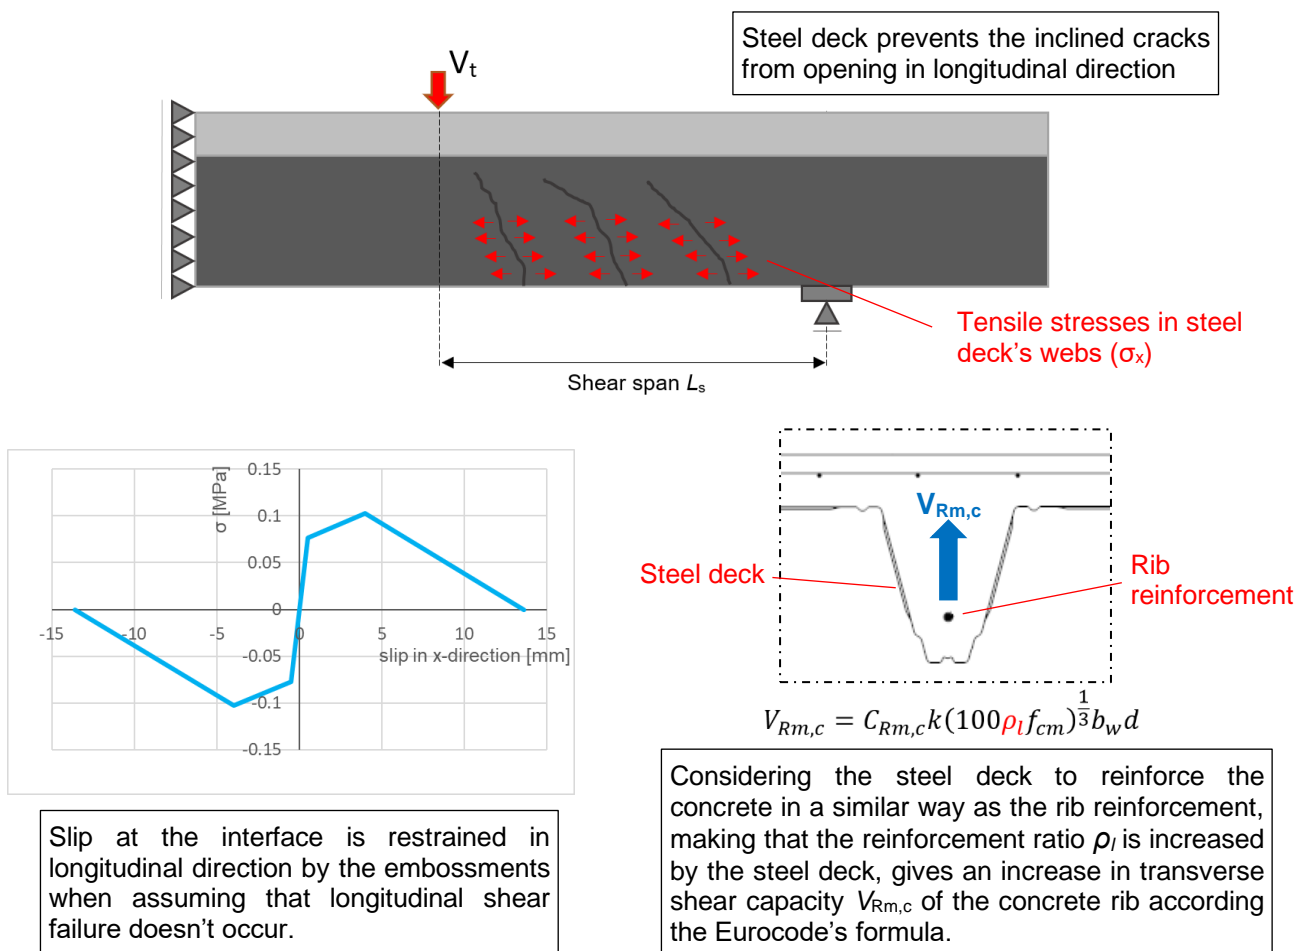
Steel deck acting as reinforcement in longitudinal direction
